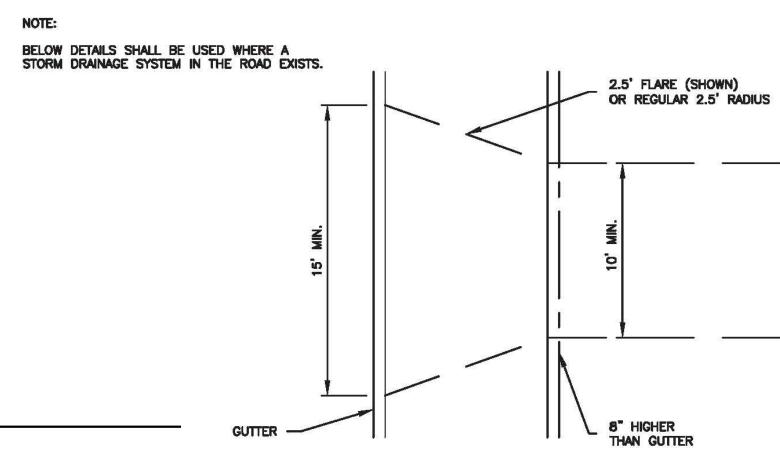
DETAIL PROVIDED BY THE CONNECTICUT DEPARTMENT OF TRANSPORTATION
